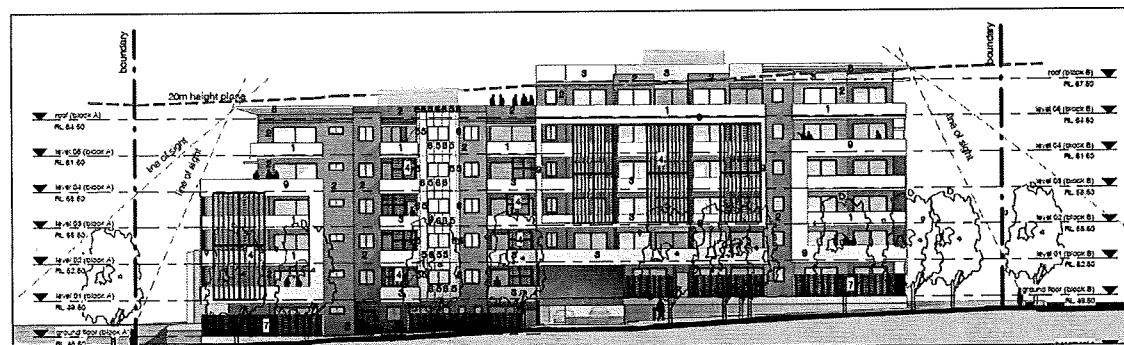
Alice Street elevation - 20 metre height shown in blue (Source: GM Architects)
